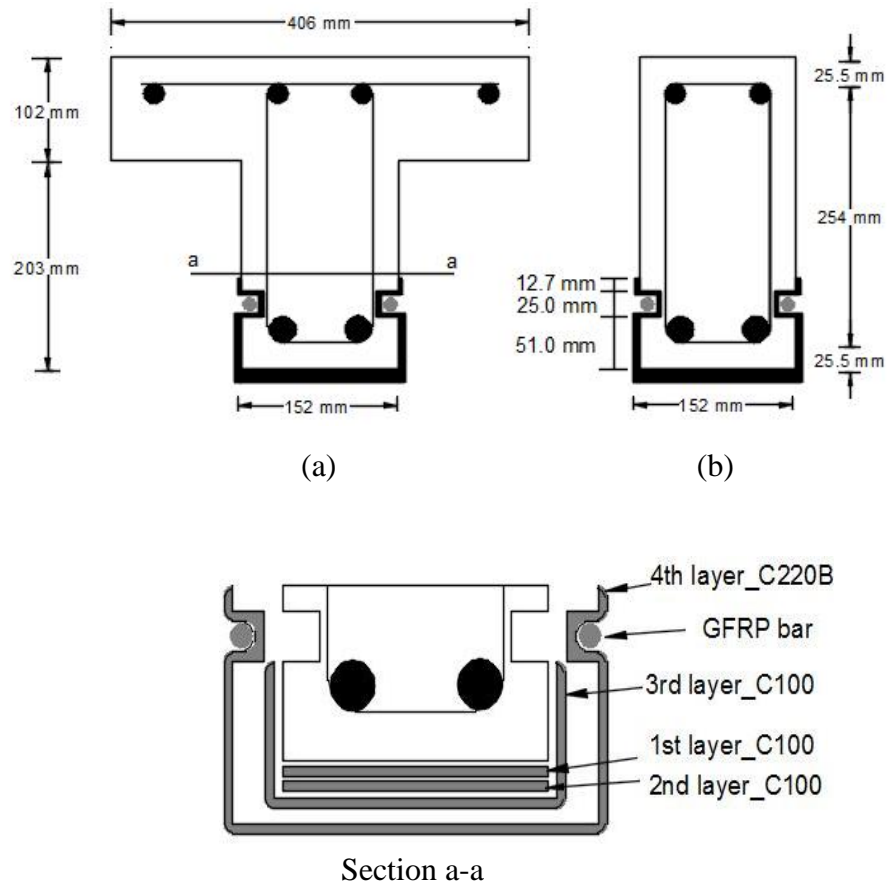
Beam cross section details for set 2 (a) T beam; (b) rectangular beam
